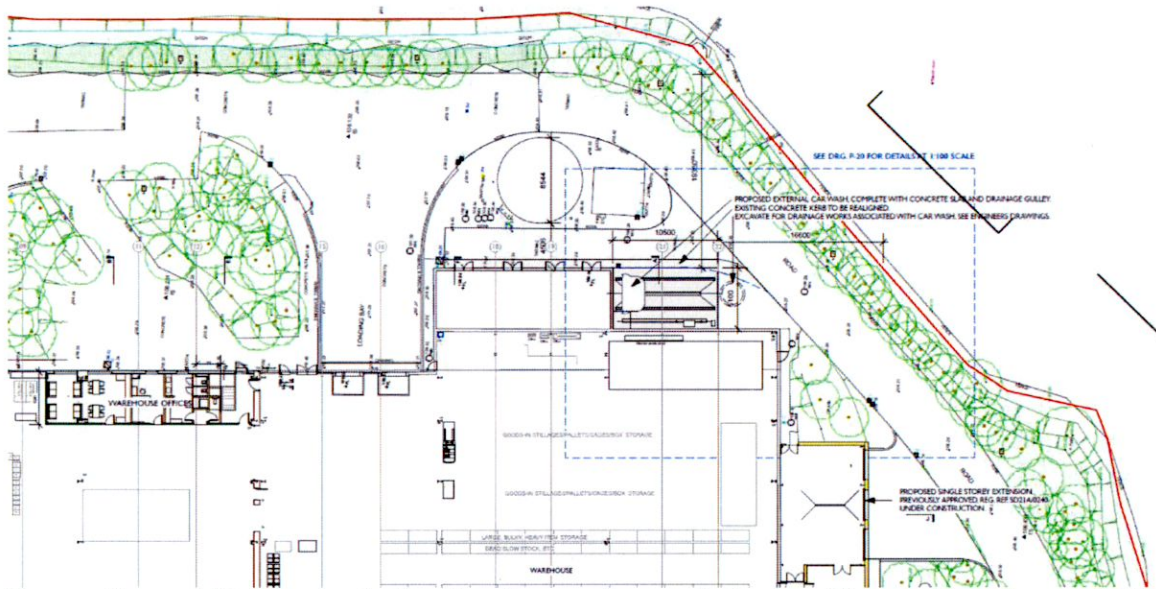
Proposed Site Plan showing location of proposed car wash structure. (Extracted from dwg. no. P-01C EMD Architects)
